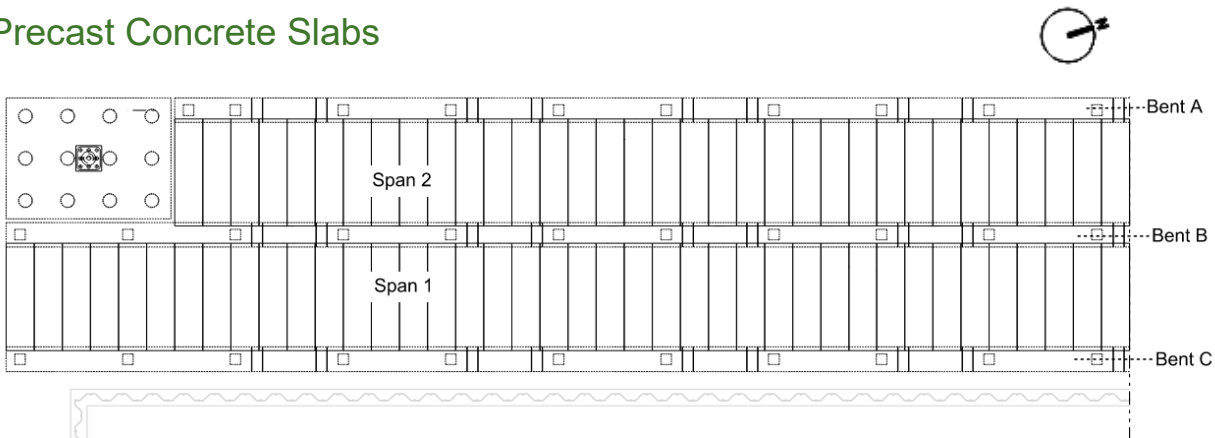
Design Drawings: Partial Concrete Slab Layout
